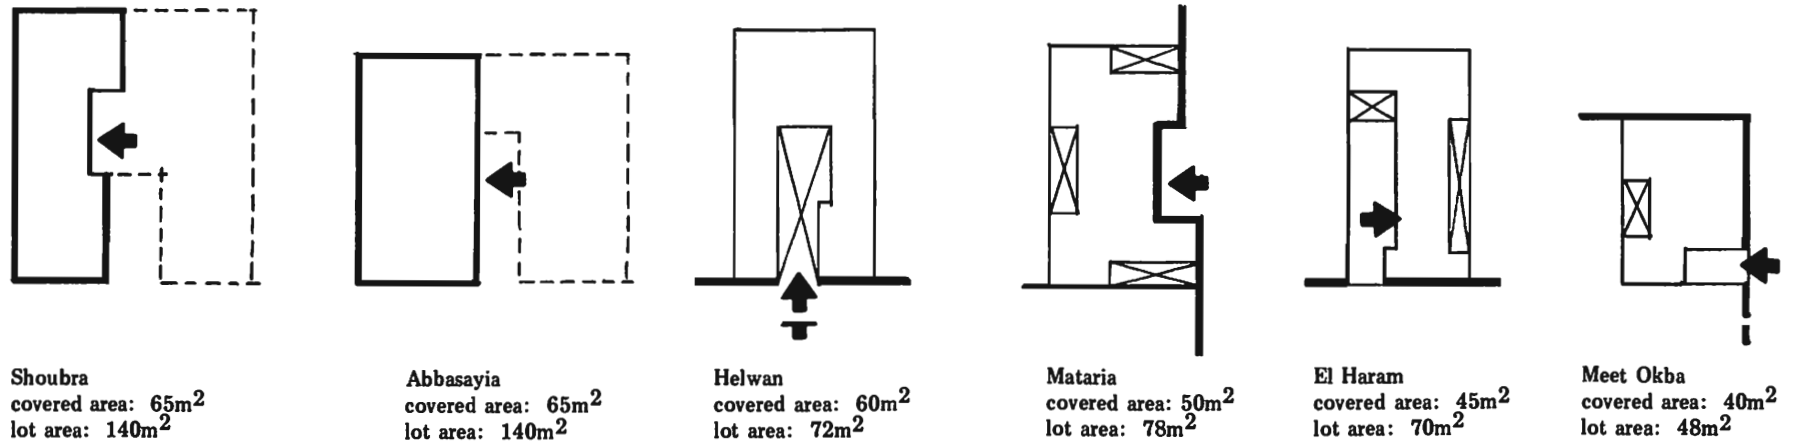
SCHEMATIC LAYOUT OF DWELLINGS (from case studies)
